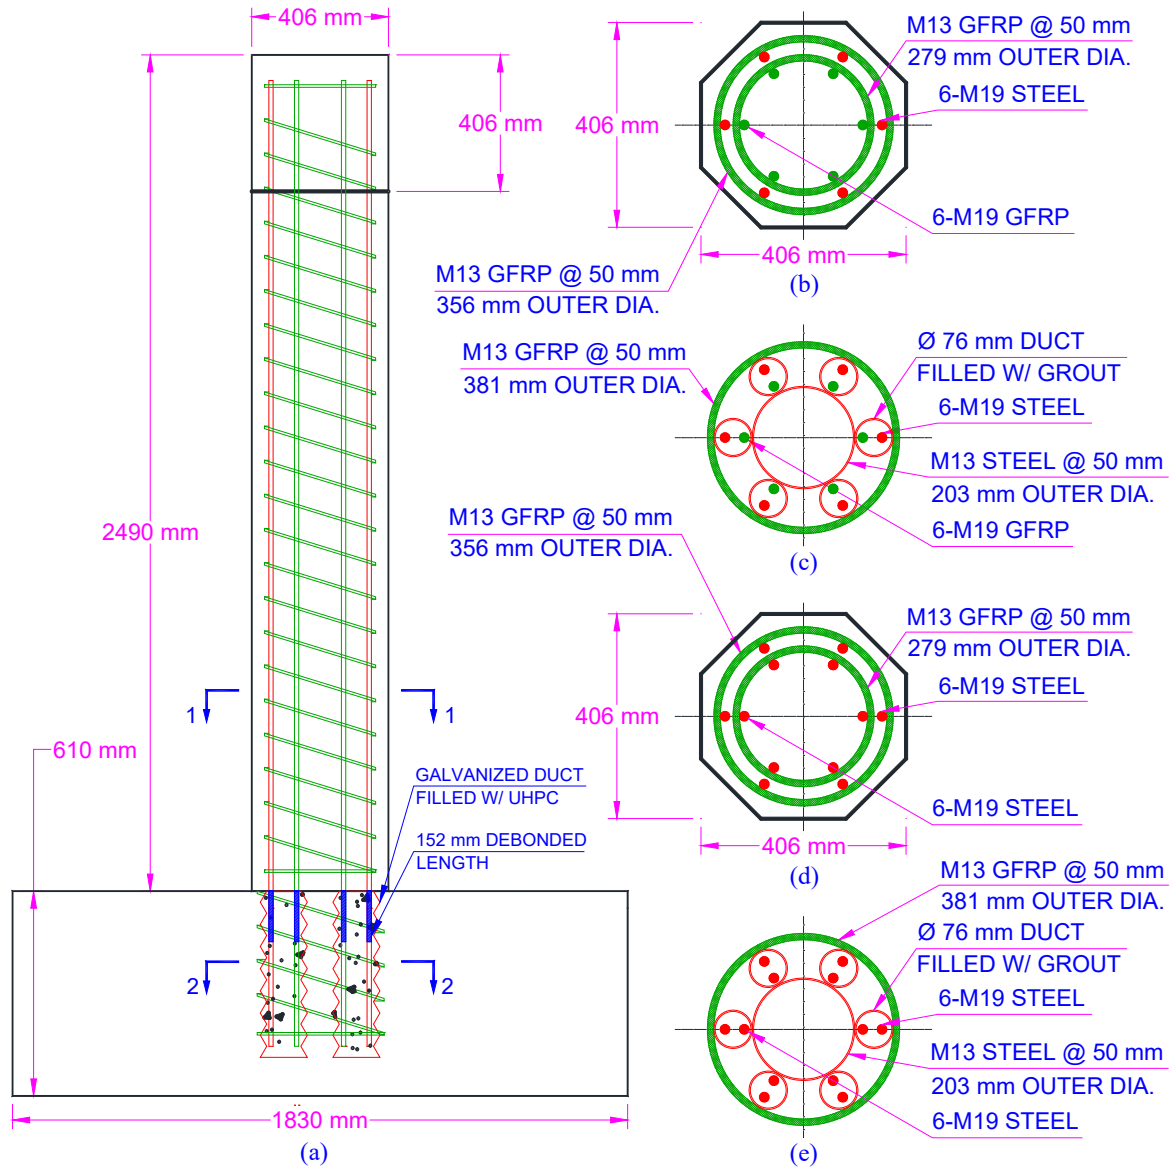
Non-PT column configuration: (a) side view; (b) section 1-1 HYB column; (c) section 2-2 HYB column; (d) section 1-1 STL column; (e) section 2-2 STL column
